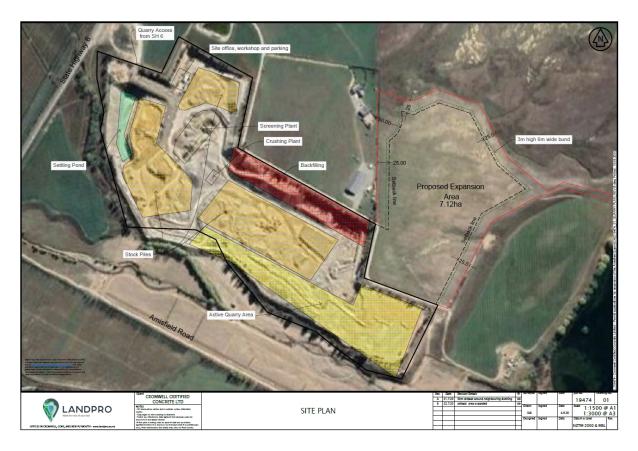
Extraction plan and aerial photograph (Source: LANDPRO)
